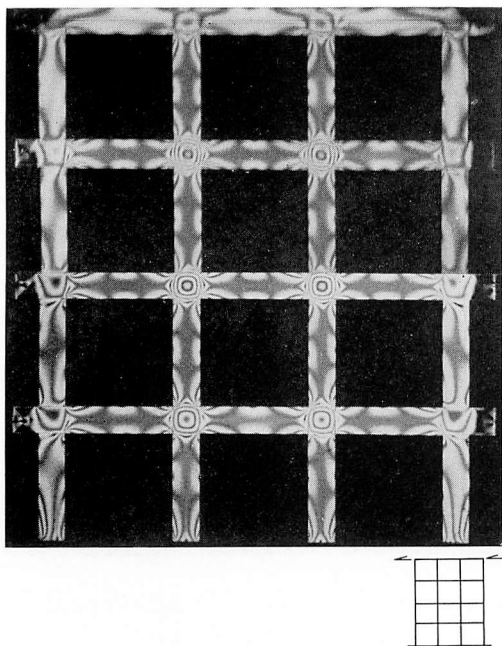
a Isochromatics of Frame without Wall Panel Subjected to Lateral Forces on Roof Beams
